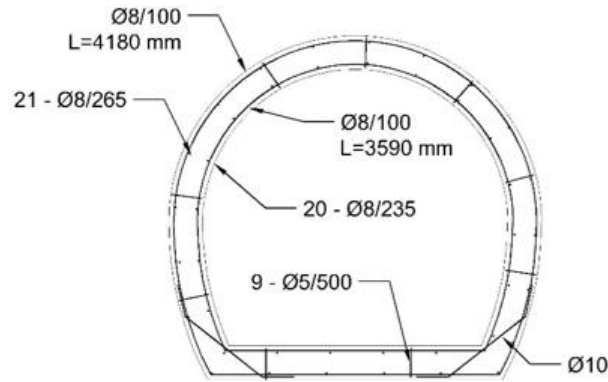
Scaled reinforcement arrangement [Kalaycıoğlu, 2019]
